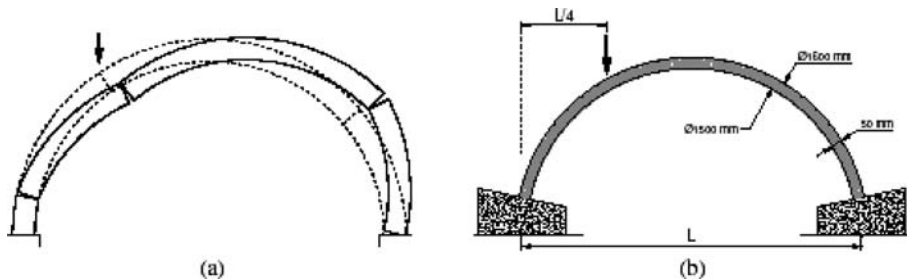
Semi-circular masonry arch: (a) typical four-hinge failure mechanism; (b) adopted arch geometry and load scheme.
